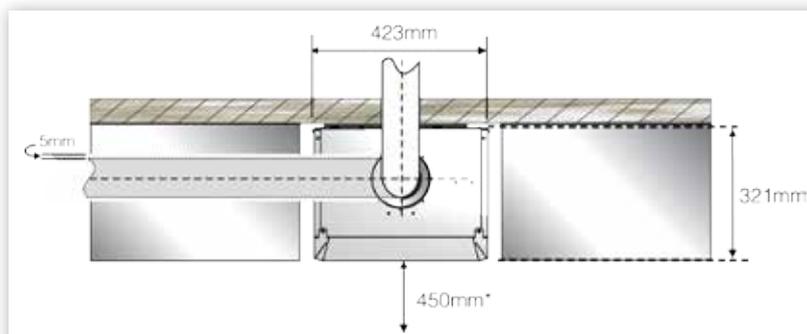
FLUE CLEARANCES KITCHEN LAYOUT - TOP VIEW
